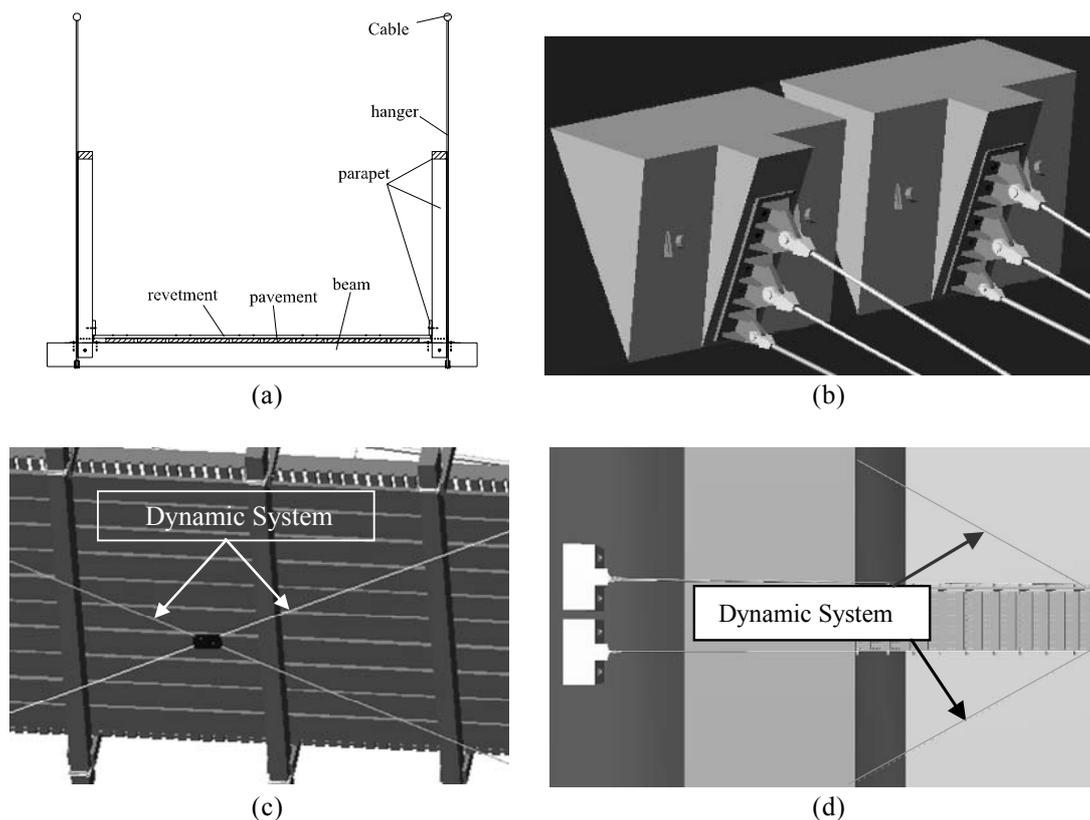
(a) Transversal section; (b) Reinforced concrete blocks; (c) Dynamic system (3D view under the deck); (d) 3-D Aerial view.
